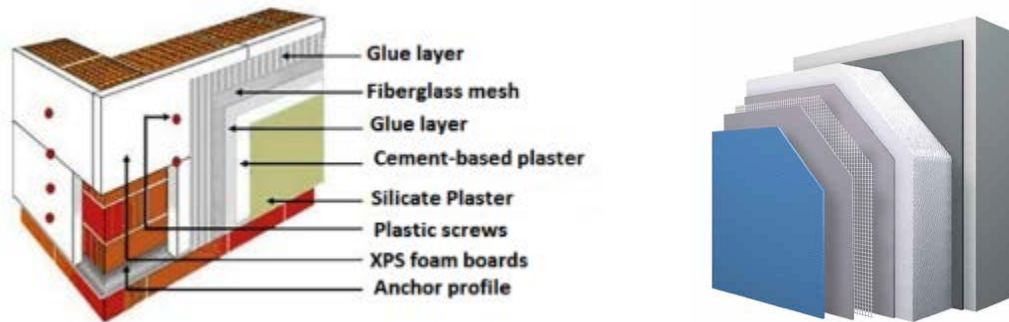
Cross section of an insulated wall (exterior thermal insulation composite system)
